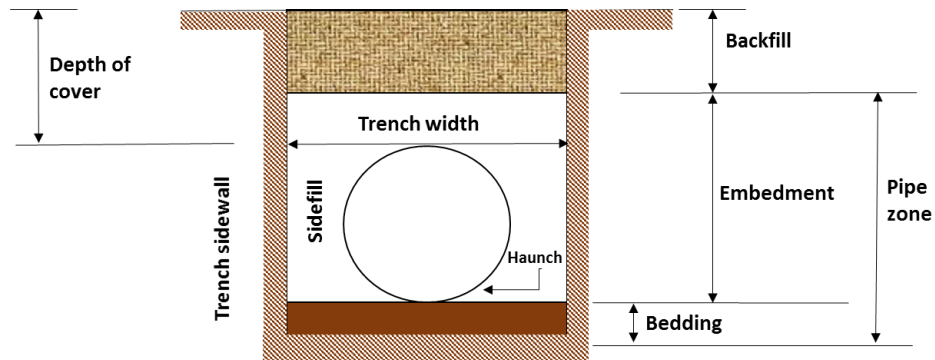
Schematic of the typical terminologies used in pipe and trench configurations from ASCE Buried Flexible Steel Pipe (2009)
